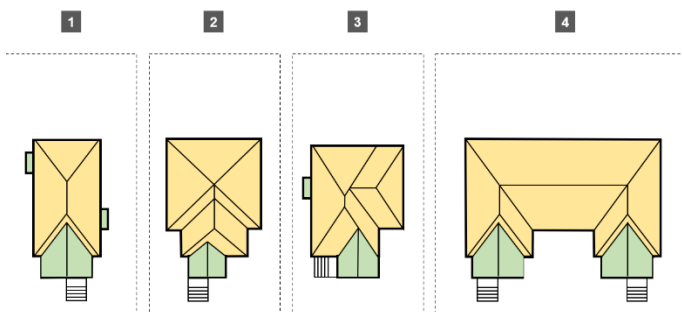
Primary Roof Structure & Secondary Roof Structures (Plan View)
